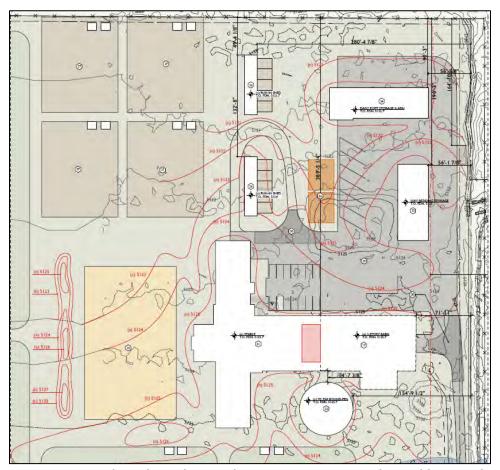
Proposed grading plan, with existing contours indicated by gray lines and proposed contours indicated in red lines.
